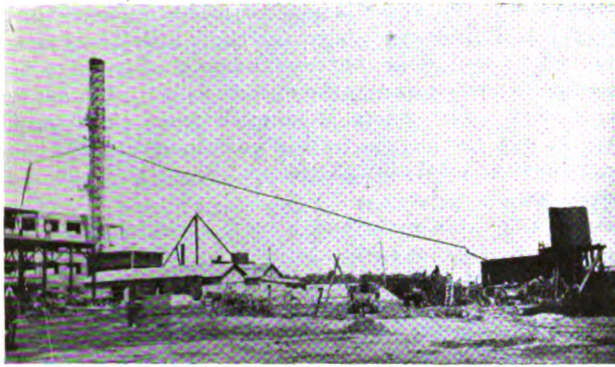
TOWER WITH LONG CHUTE FOR CONCRETE.
